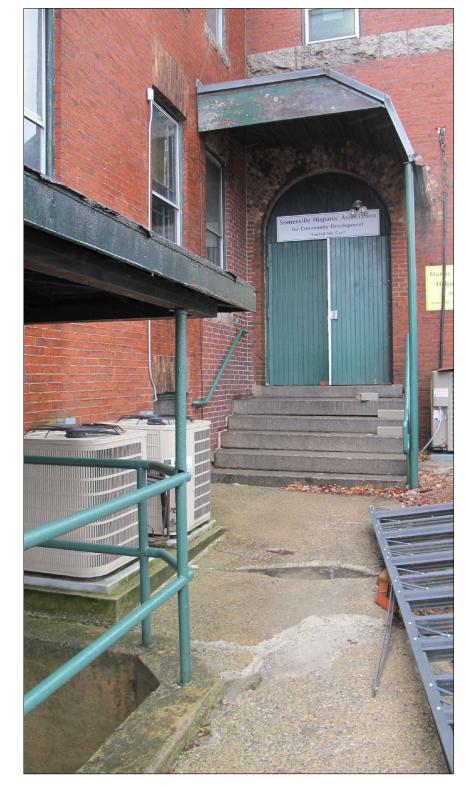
Existing door and stairs at Sanctuary entrance.
